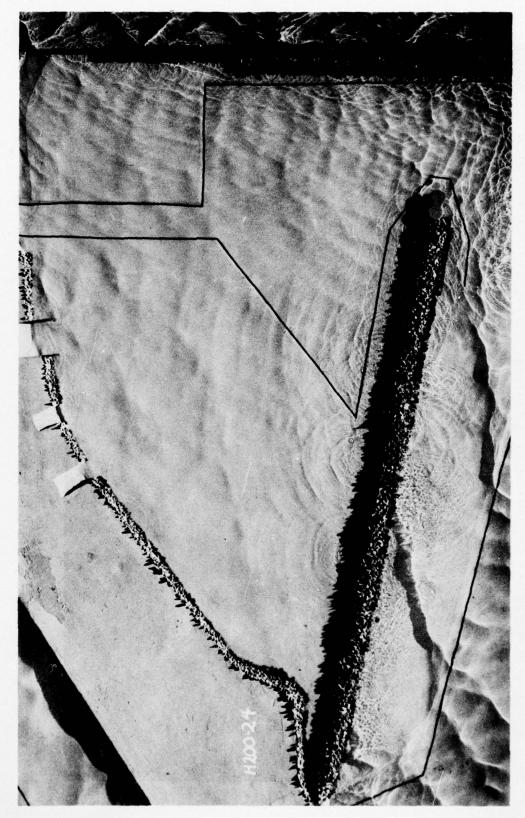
Typical wave patterns in proposed small-boat basin for plan 1; 8.3-sec, 10.4-ft waves approaching from S37°10'Ε
